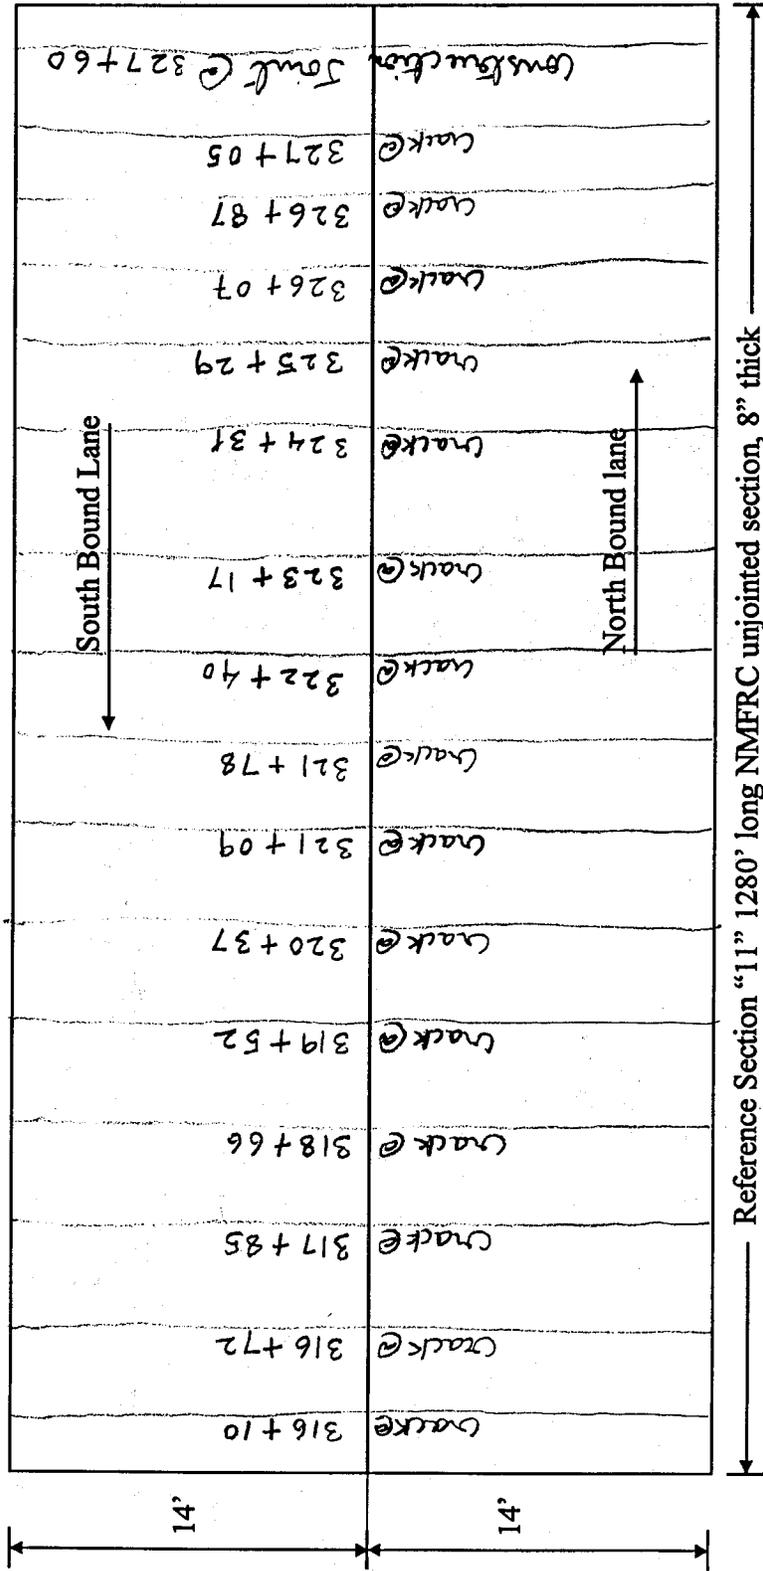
Crack Location for unjointed section of the NMFRFC Full-Depth Pavement as observed on April 17, 1998
